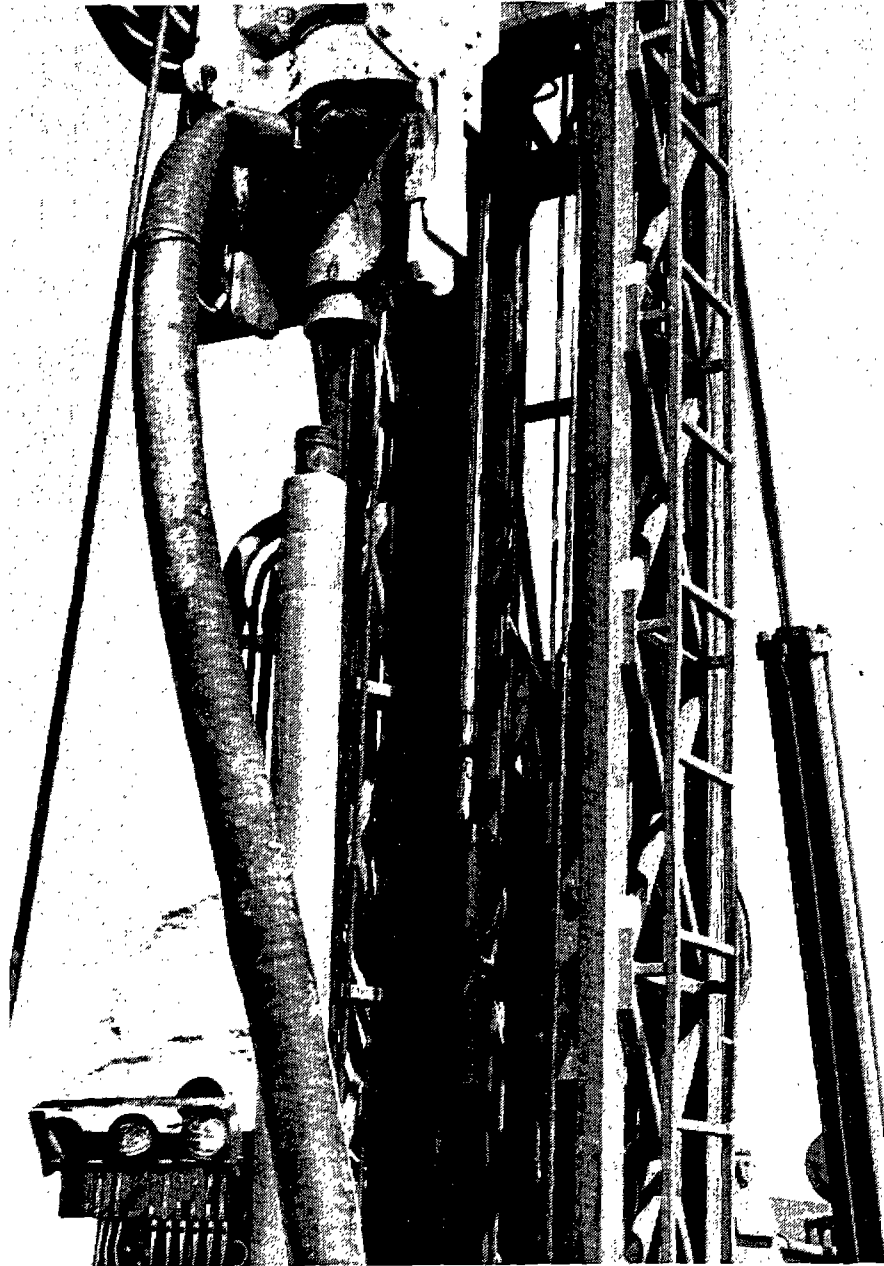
PHOTOGRAPH SHOWING THE HYDRAULIC AND CABLE SUPPORT SYSTEM FOR THE DIESEL HAMMER ON THE AP-1000 DRILL RIG MAST
